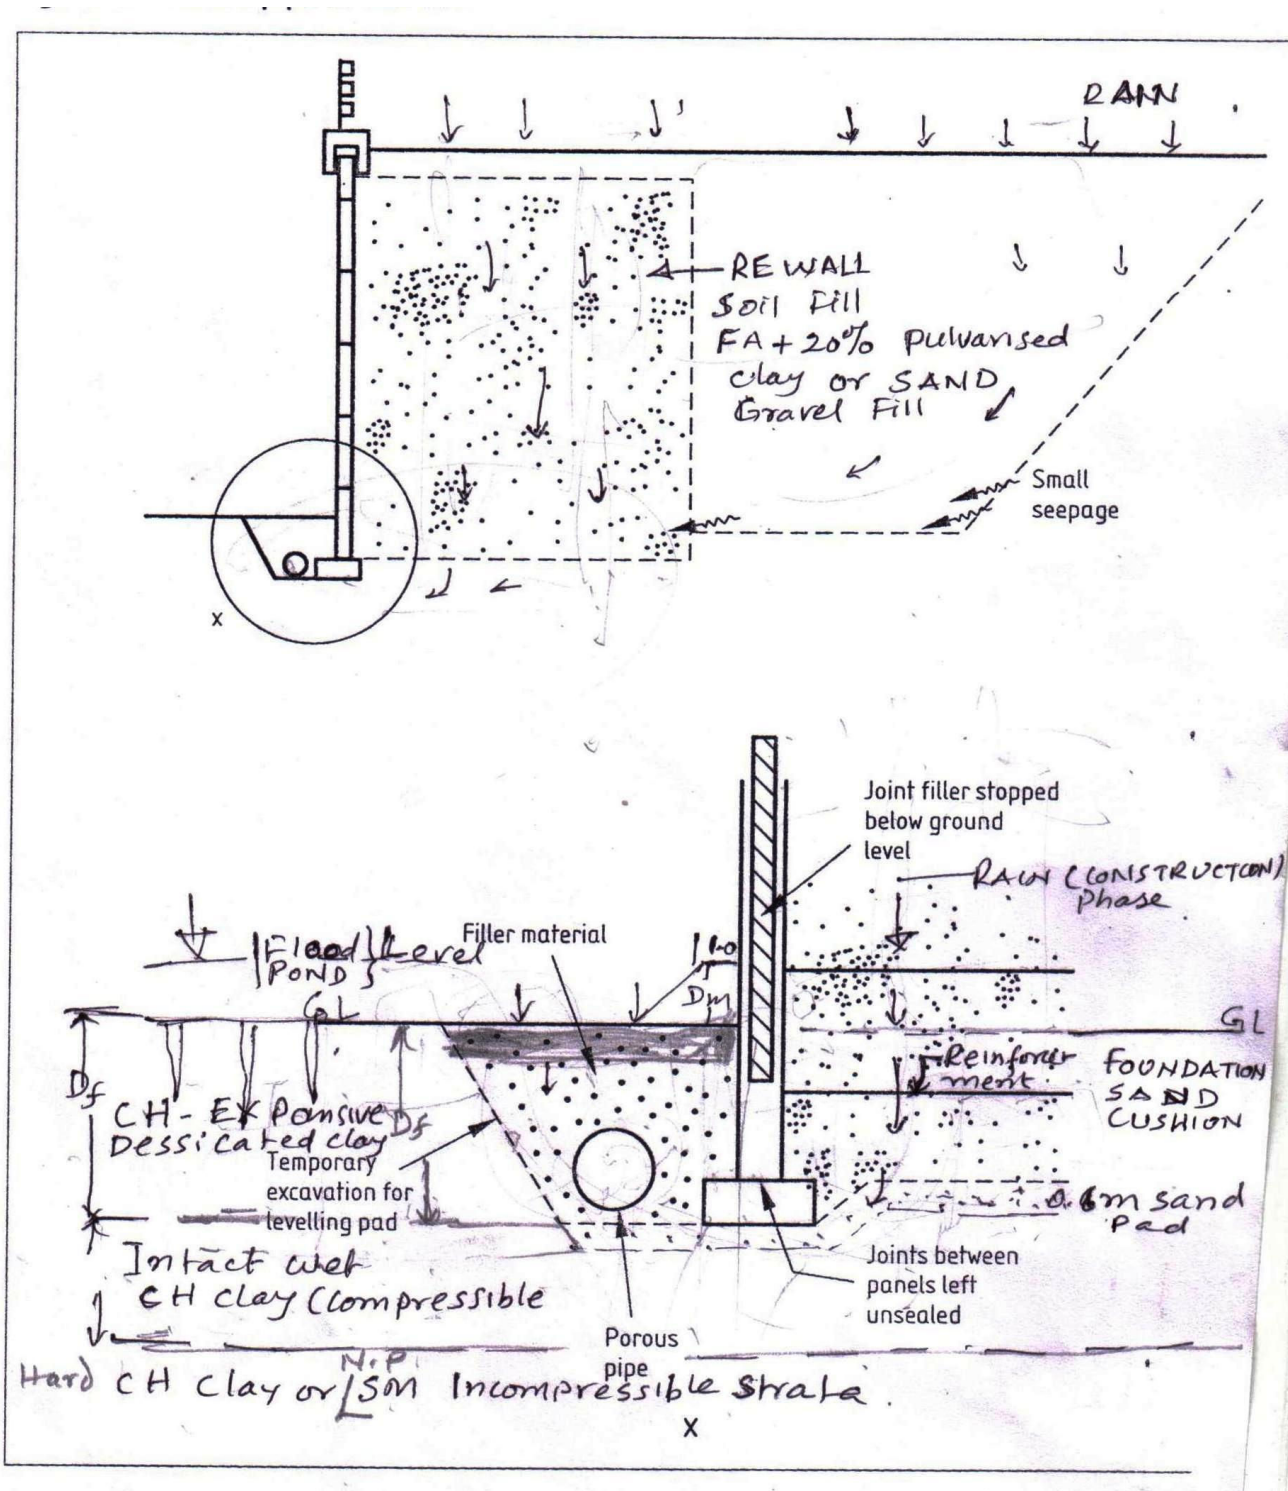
Ground treatment during construction of foundation for RE wall. Influence of Rain during construction.
